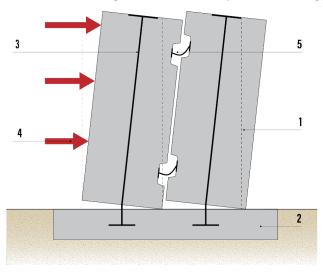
Two concrete walls side by side (1) connected to the foundations (2) by steel tendons (3) which stretch during earthquake loads (4). Steel plates (5) are distorted, absorbing energy and reducing resonance.
